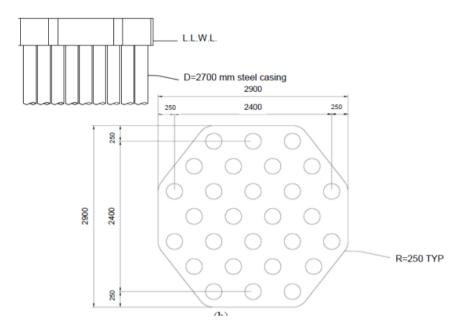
Piles arrangement of sea-crossing bridge foundation. (Retrieve from: Chen et al (2012))
